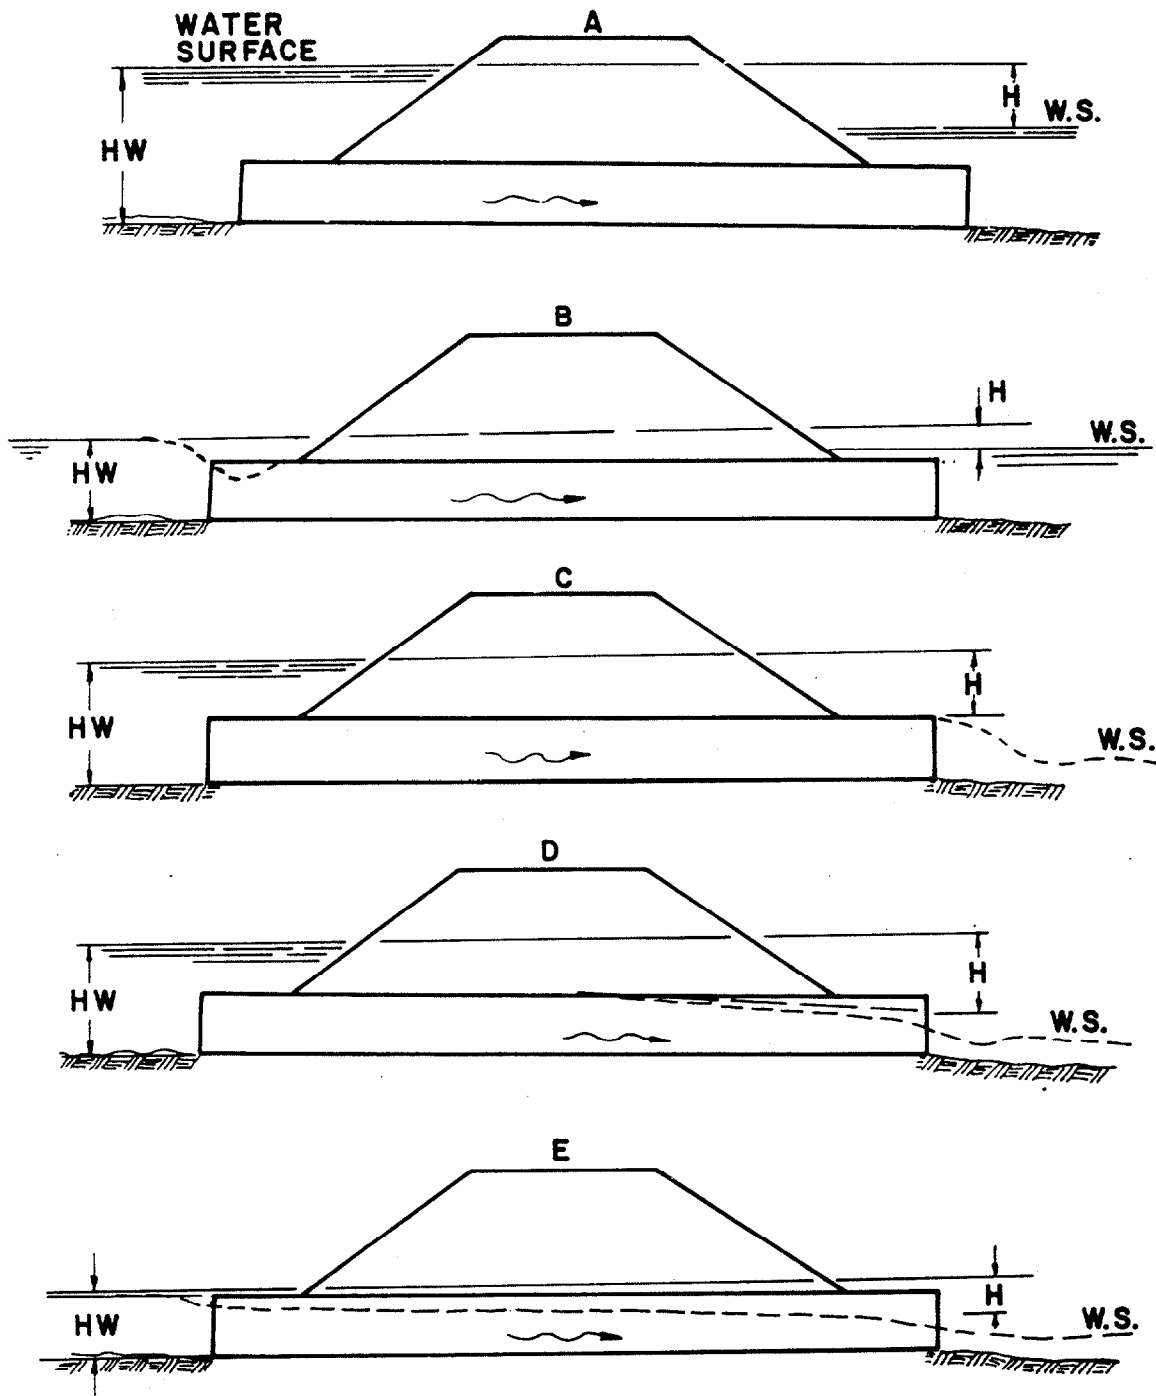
Typical culvert section under outlet control. <sup>(11)</sup>
